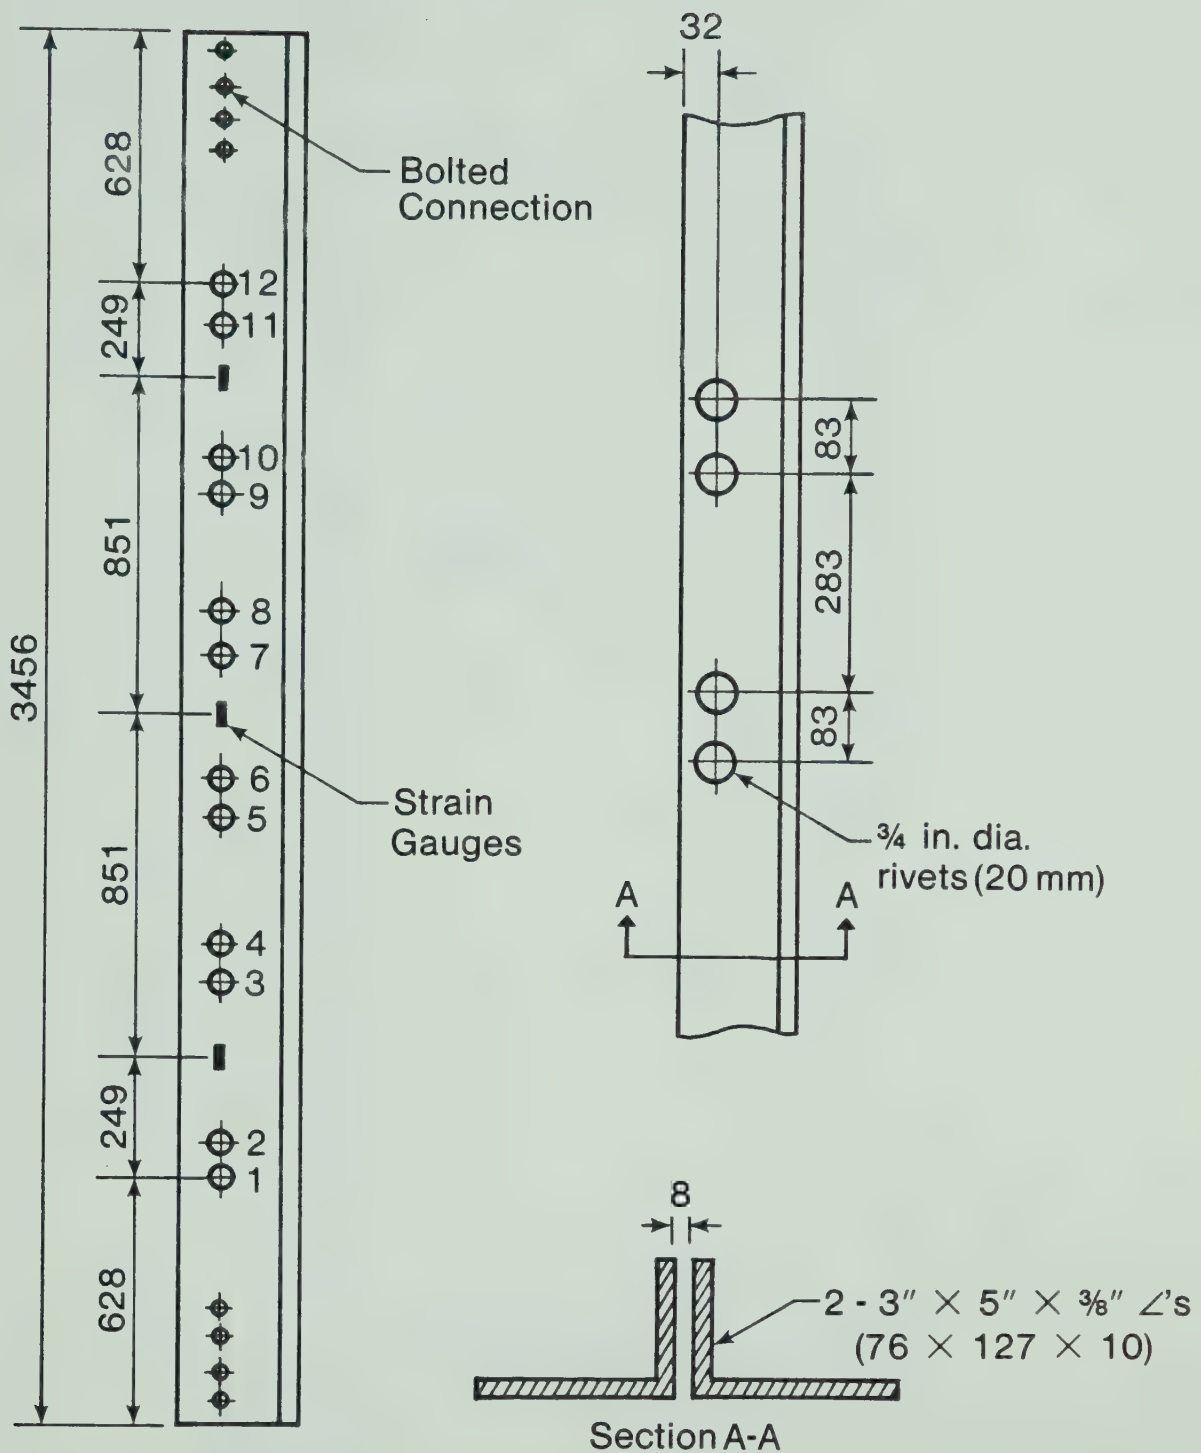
Specimen Details of Bridge Members Taken from Service
